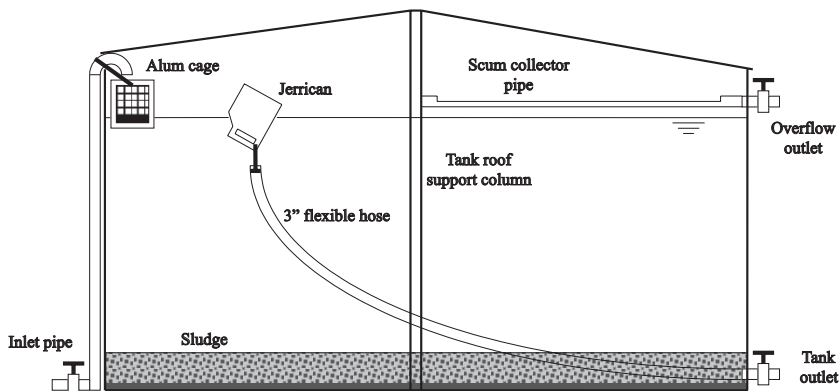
Floating outlet arrangement (alum cage and scum overflow also shown).
